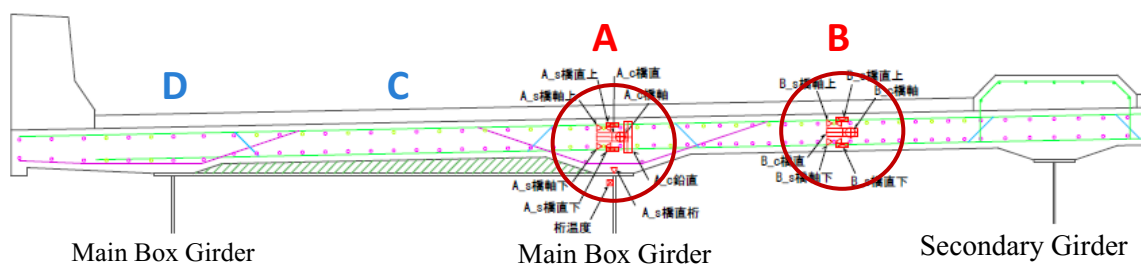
(c) Locations of measurement (A: directly connected with main girder and B: in flexural part of RC slab) in the Shinkesen Ohashi Bridge deck RC slab
